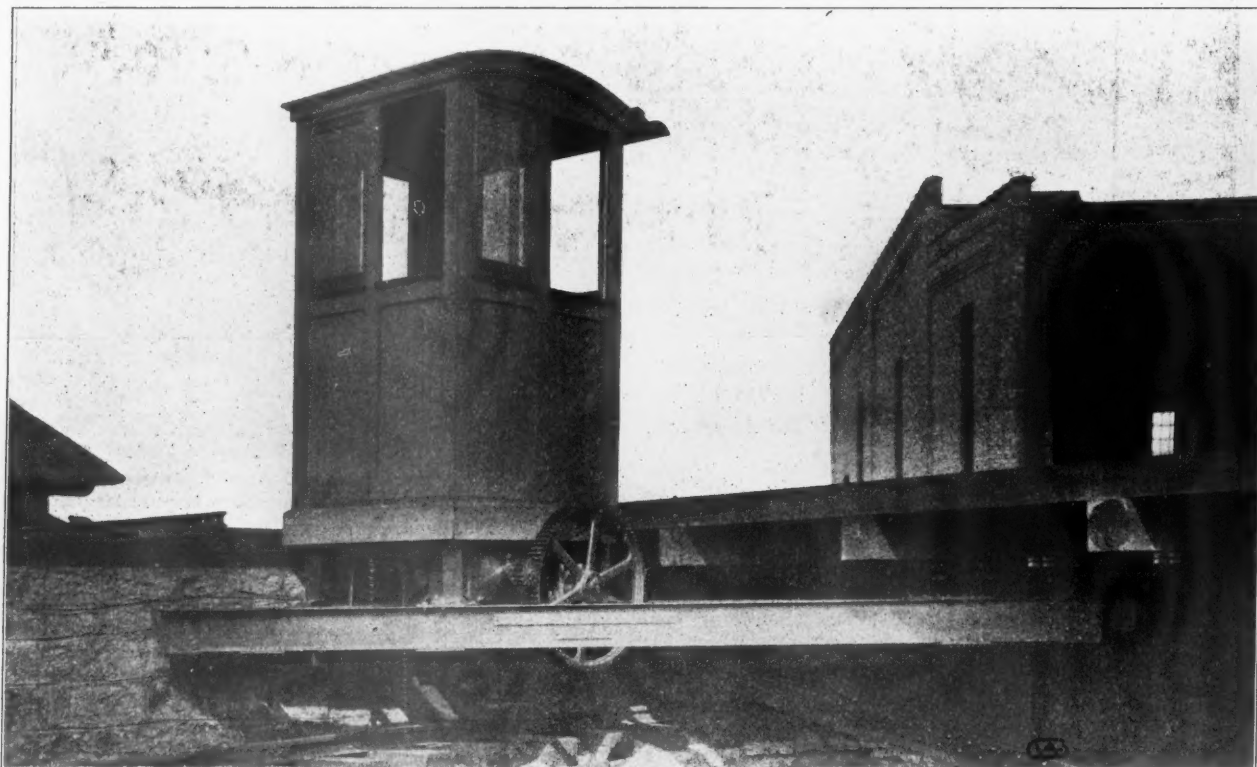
Tractor Arrangement of Turntable Shown in Fig. 13.
